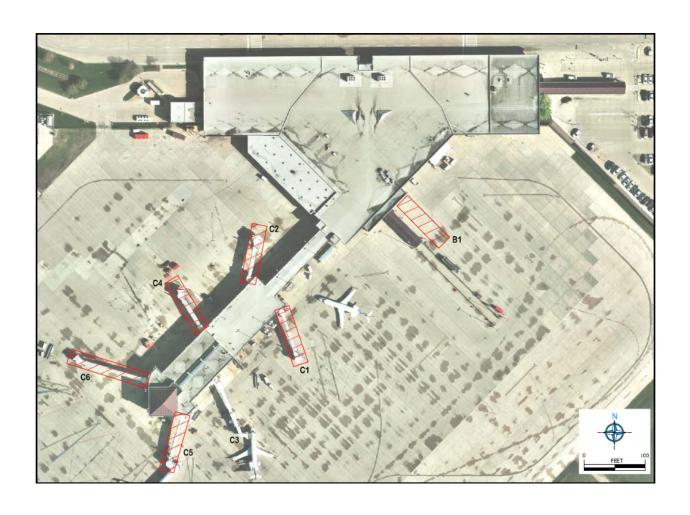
REPLACE CCTV SITE PLAN
